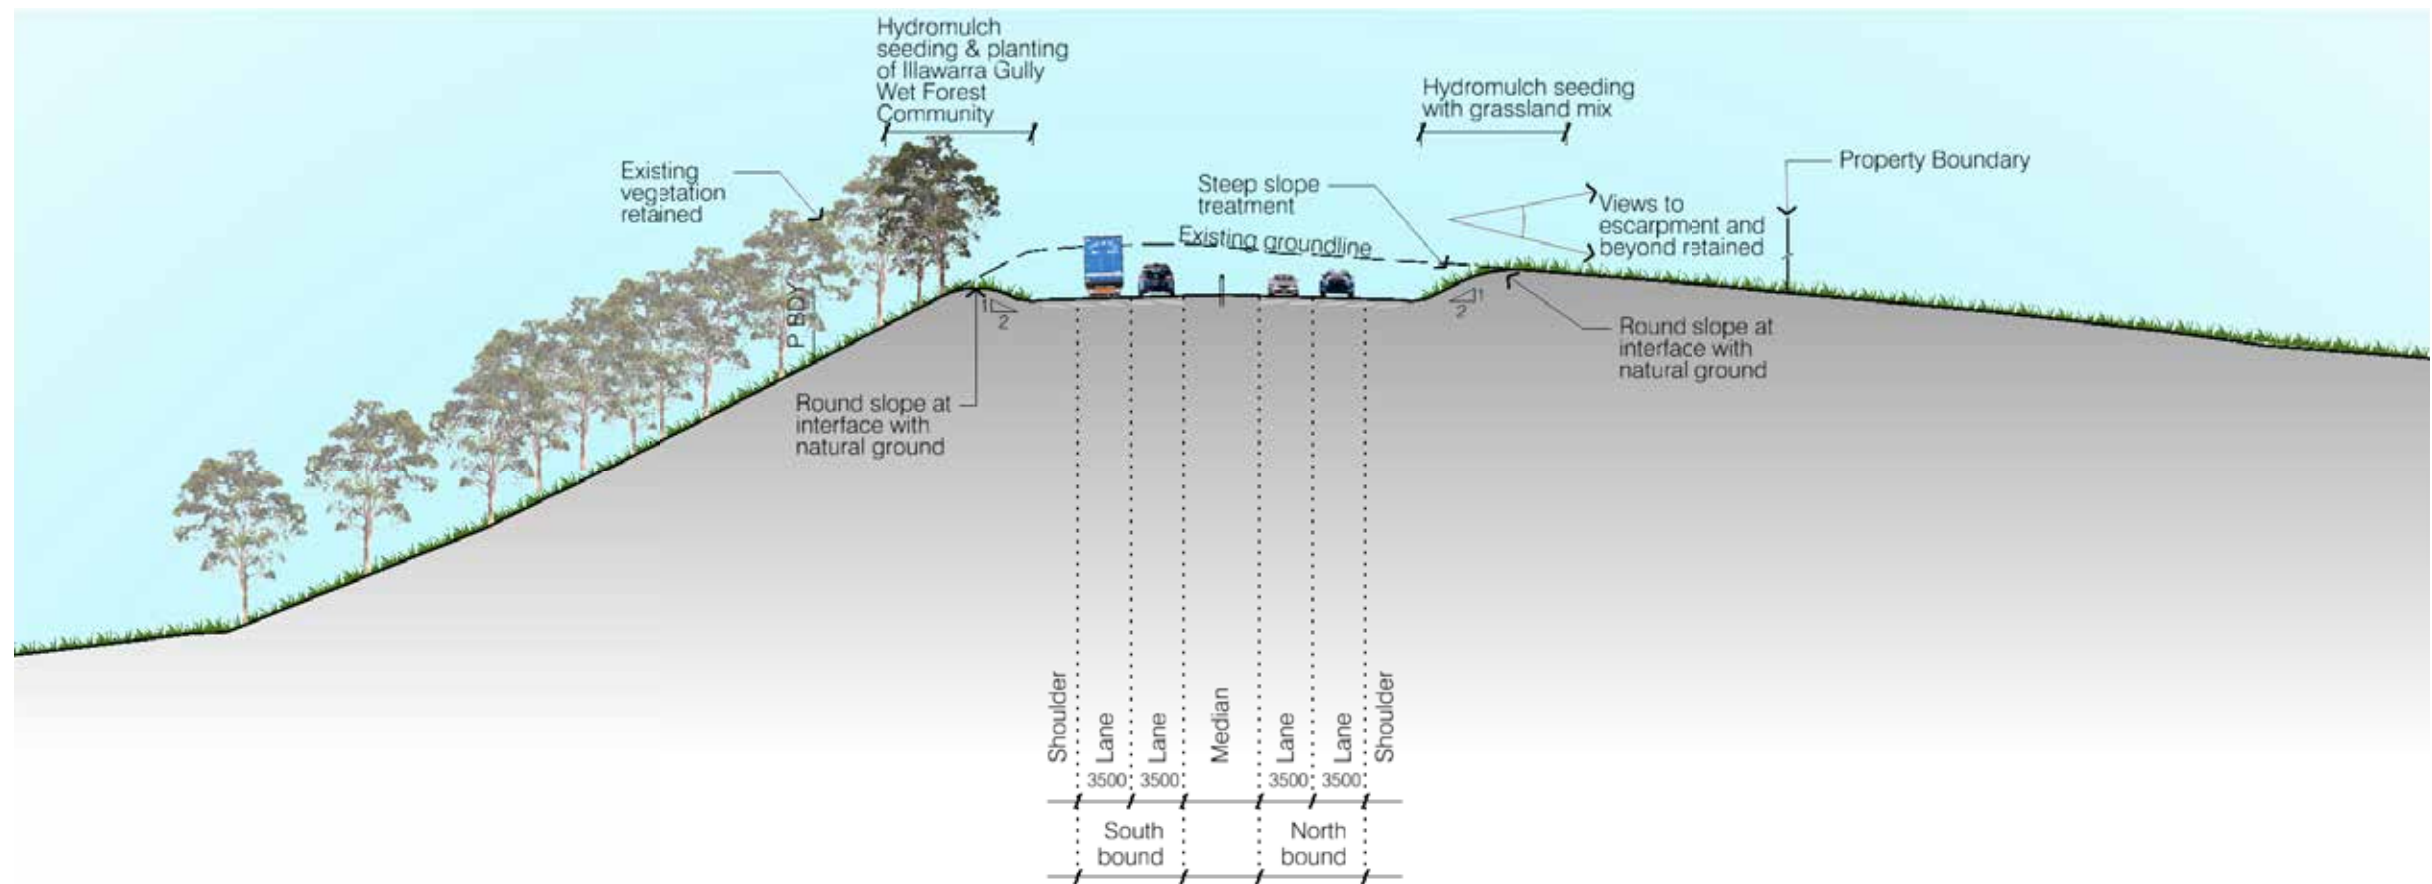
Road cross section at Ch. 14800 (Scale 1:500 @ A3)
